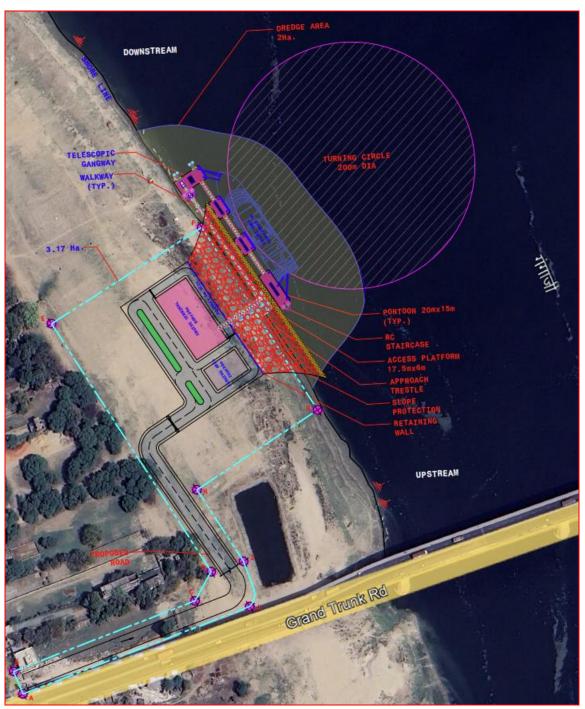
Layout of Cruise Terminal for Location D/s of Vishwasudnari Bridge
